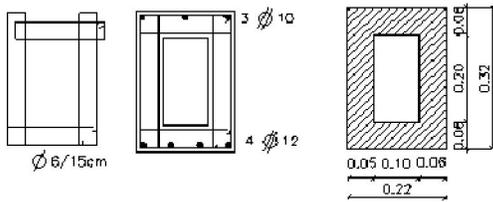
a) Details of RCB girder dimension, reinforcement.
